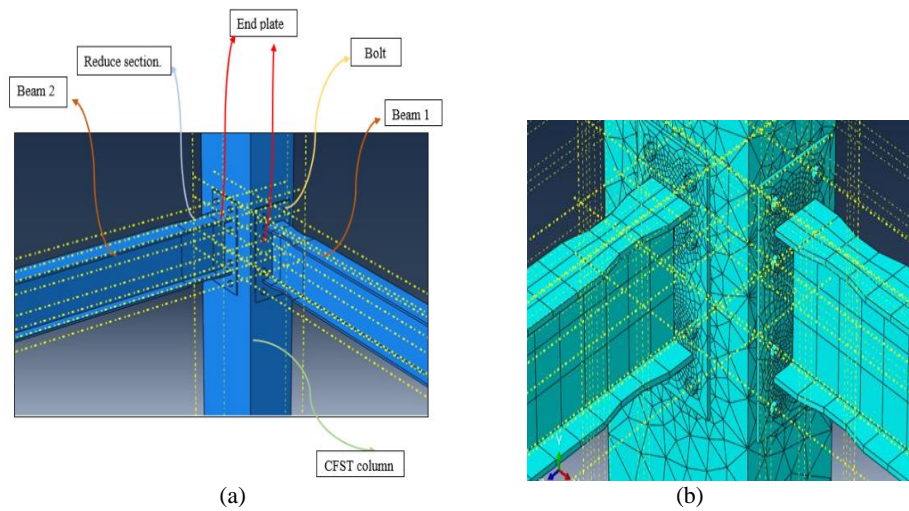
(a) Assembly of parts and (b) Meshing of parts
